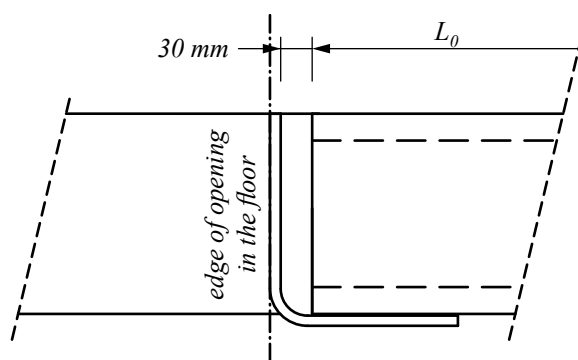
Position of supported slab (PETRA without fire reinforcement).
